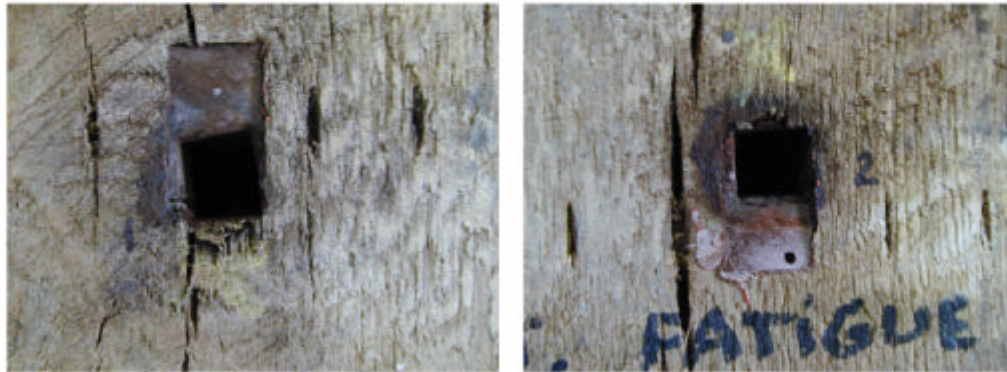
Spike holes from red ES-25 (field left, gauge right) after 1,000,000 cycles.
